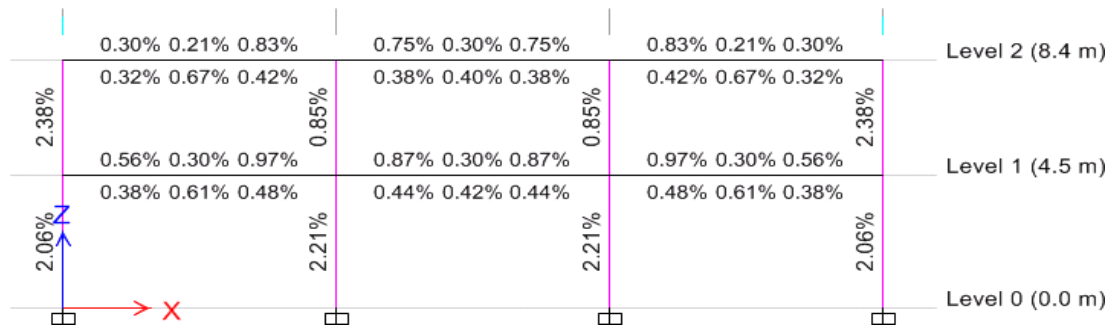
Required longitudinal reinforcement for building ID 2211
